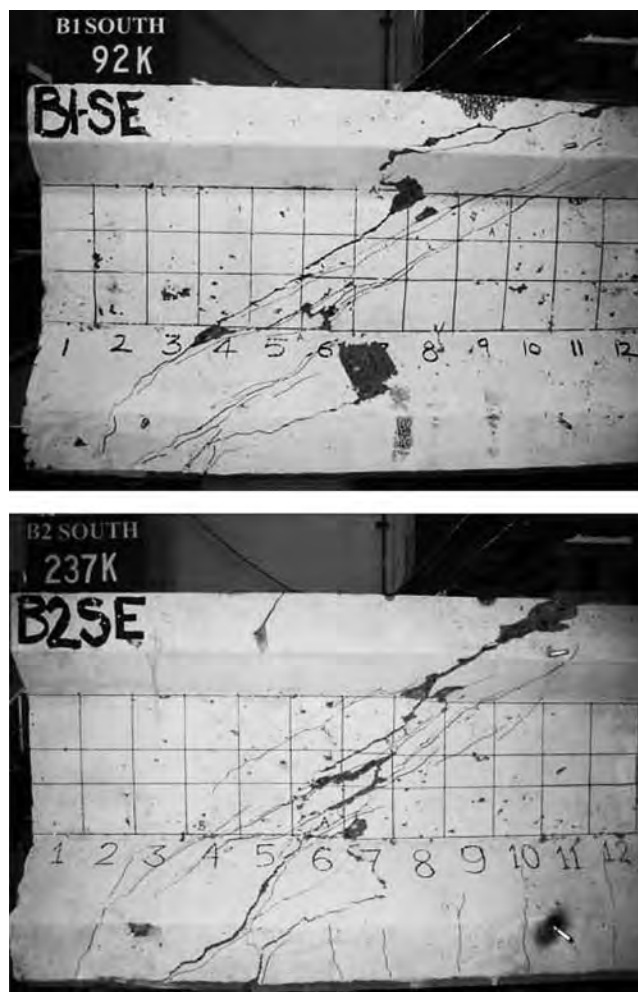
Forty-five-degree crack patterns of Beams B1 and B2 showing web-shear failure.
